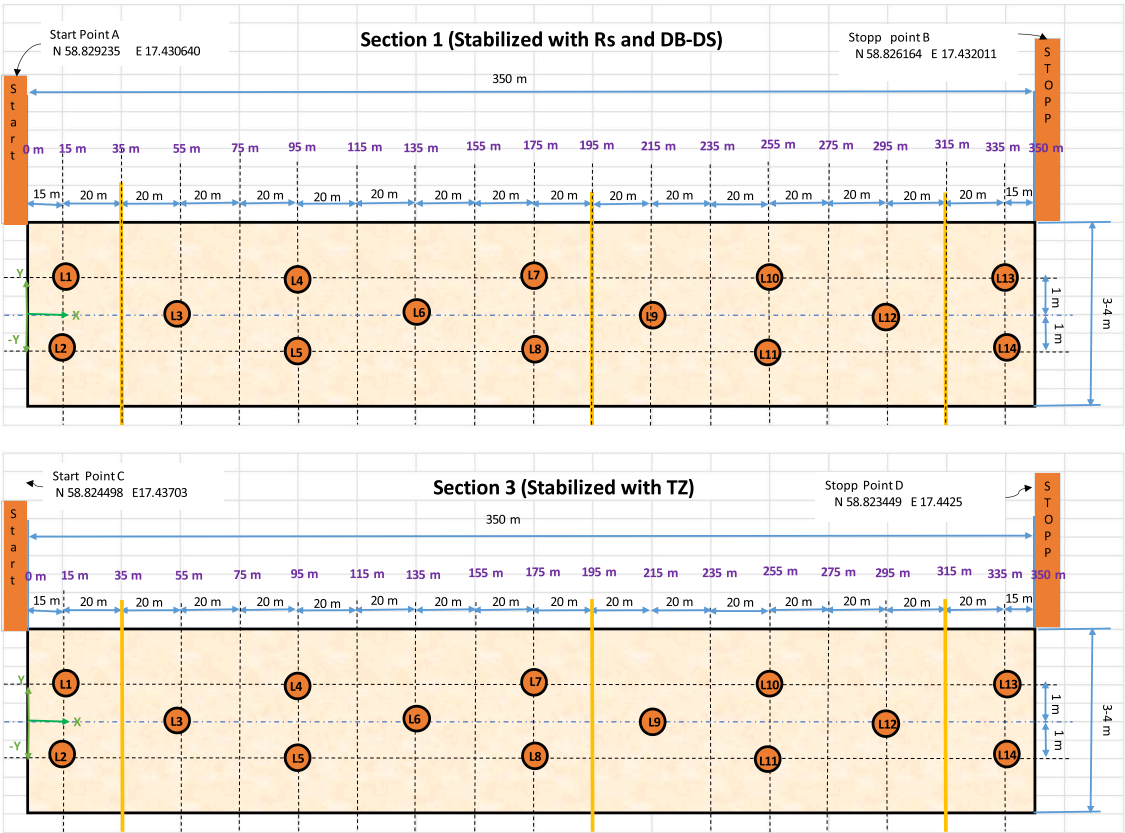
Test points and profile layout for the road Sections 1 and 3 in Trosa.
